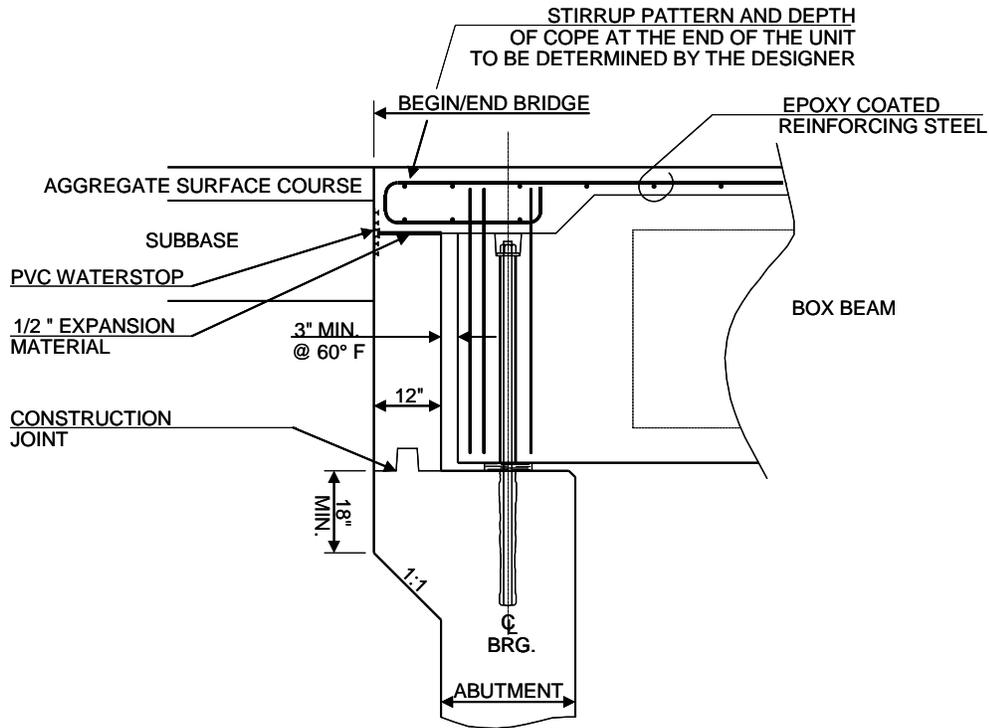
1 Box Beam Type I Bridge End Detail
